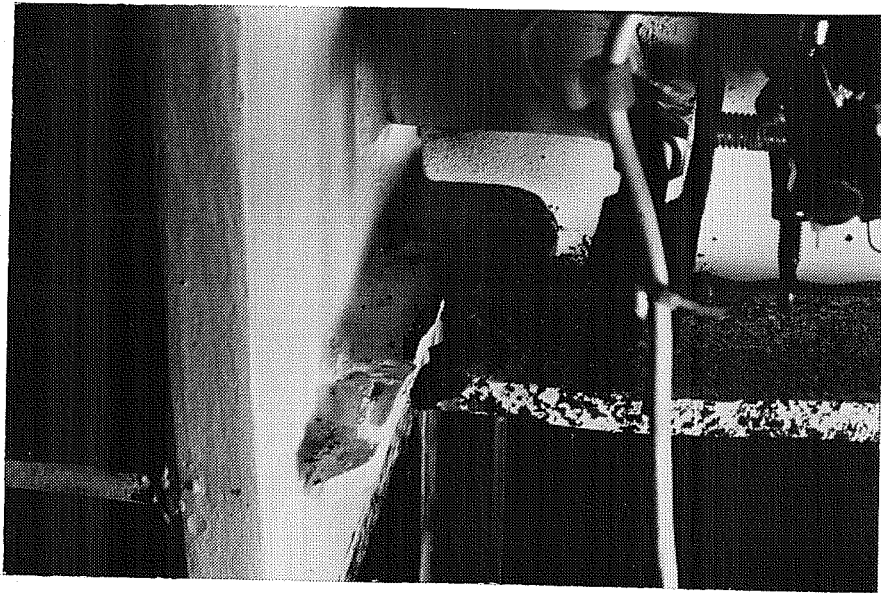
Bottom Flange Failure in Specimen 6
